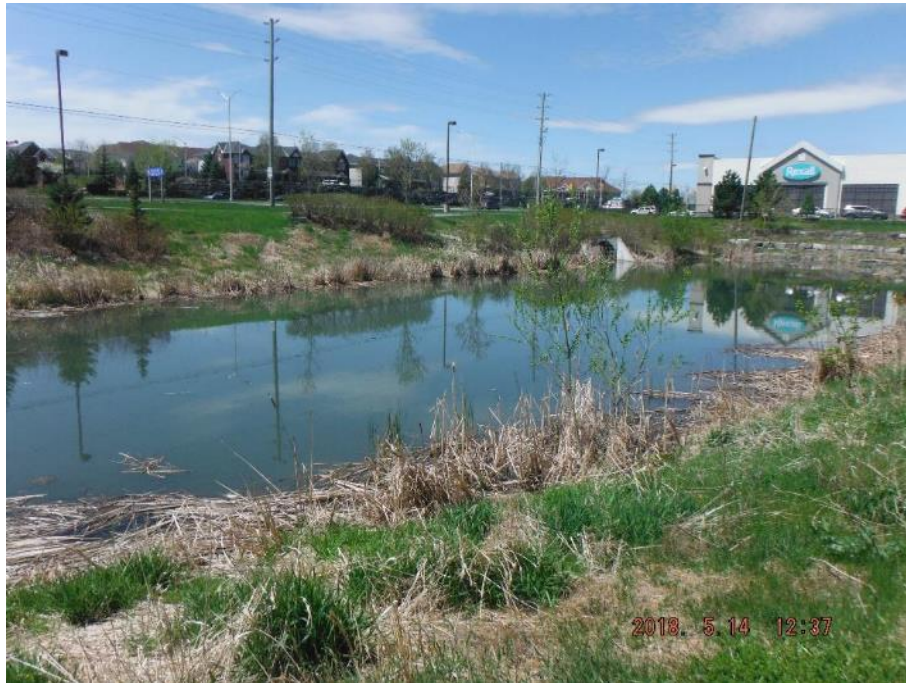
Stormwater management pond looking northwest (May 14, 2018)
